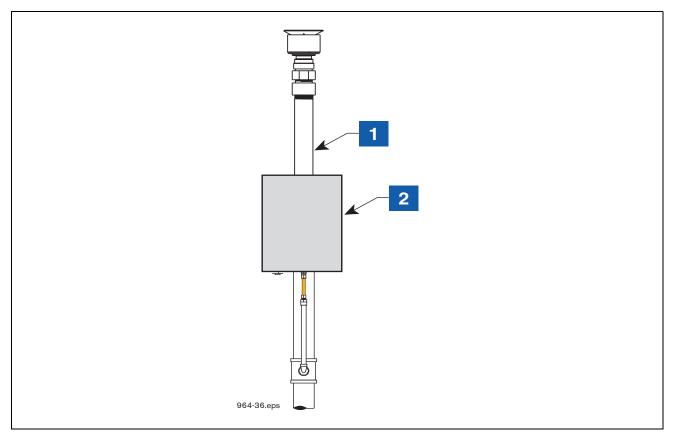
VRPS Mounted In Universal Enclosure On The Vent Stack
